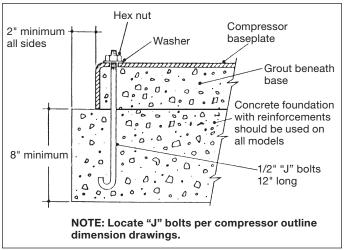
A: Recommended foundation details for a model 91 compressor.
